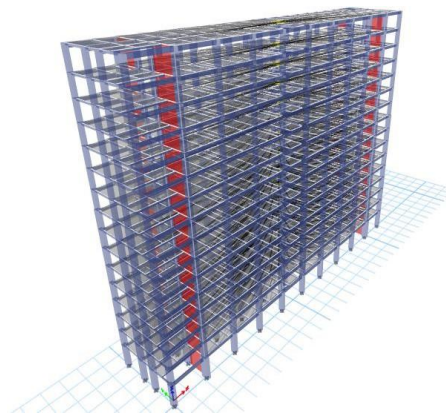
3D Modeling of Building A Rusun Jagakarsa Structure Using ETABS 18
